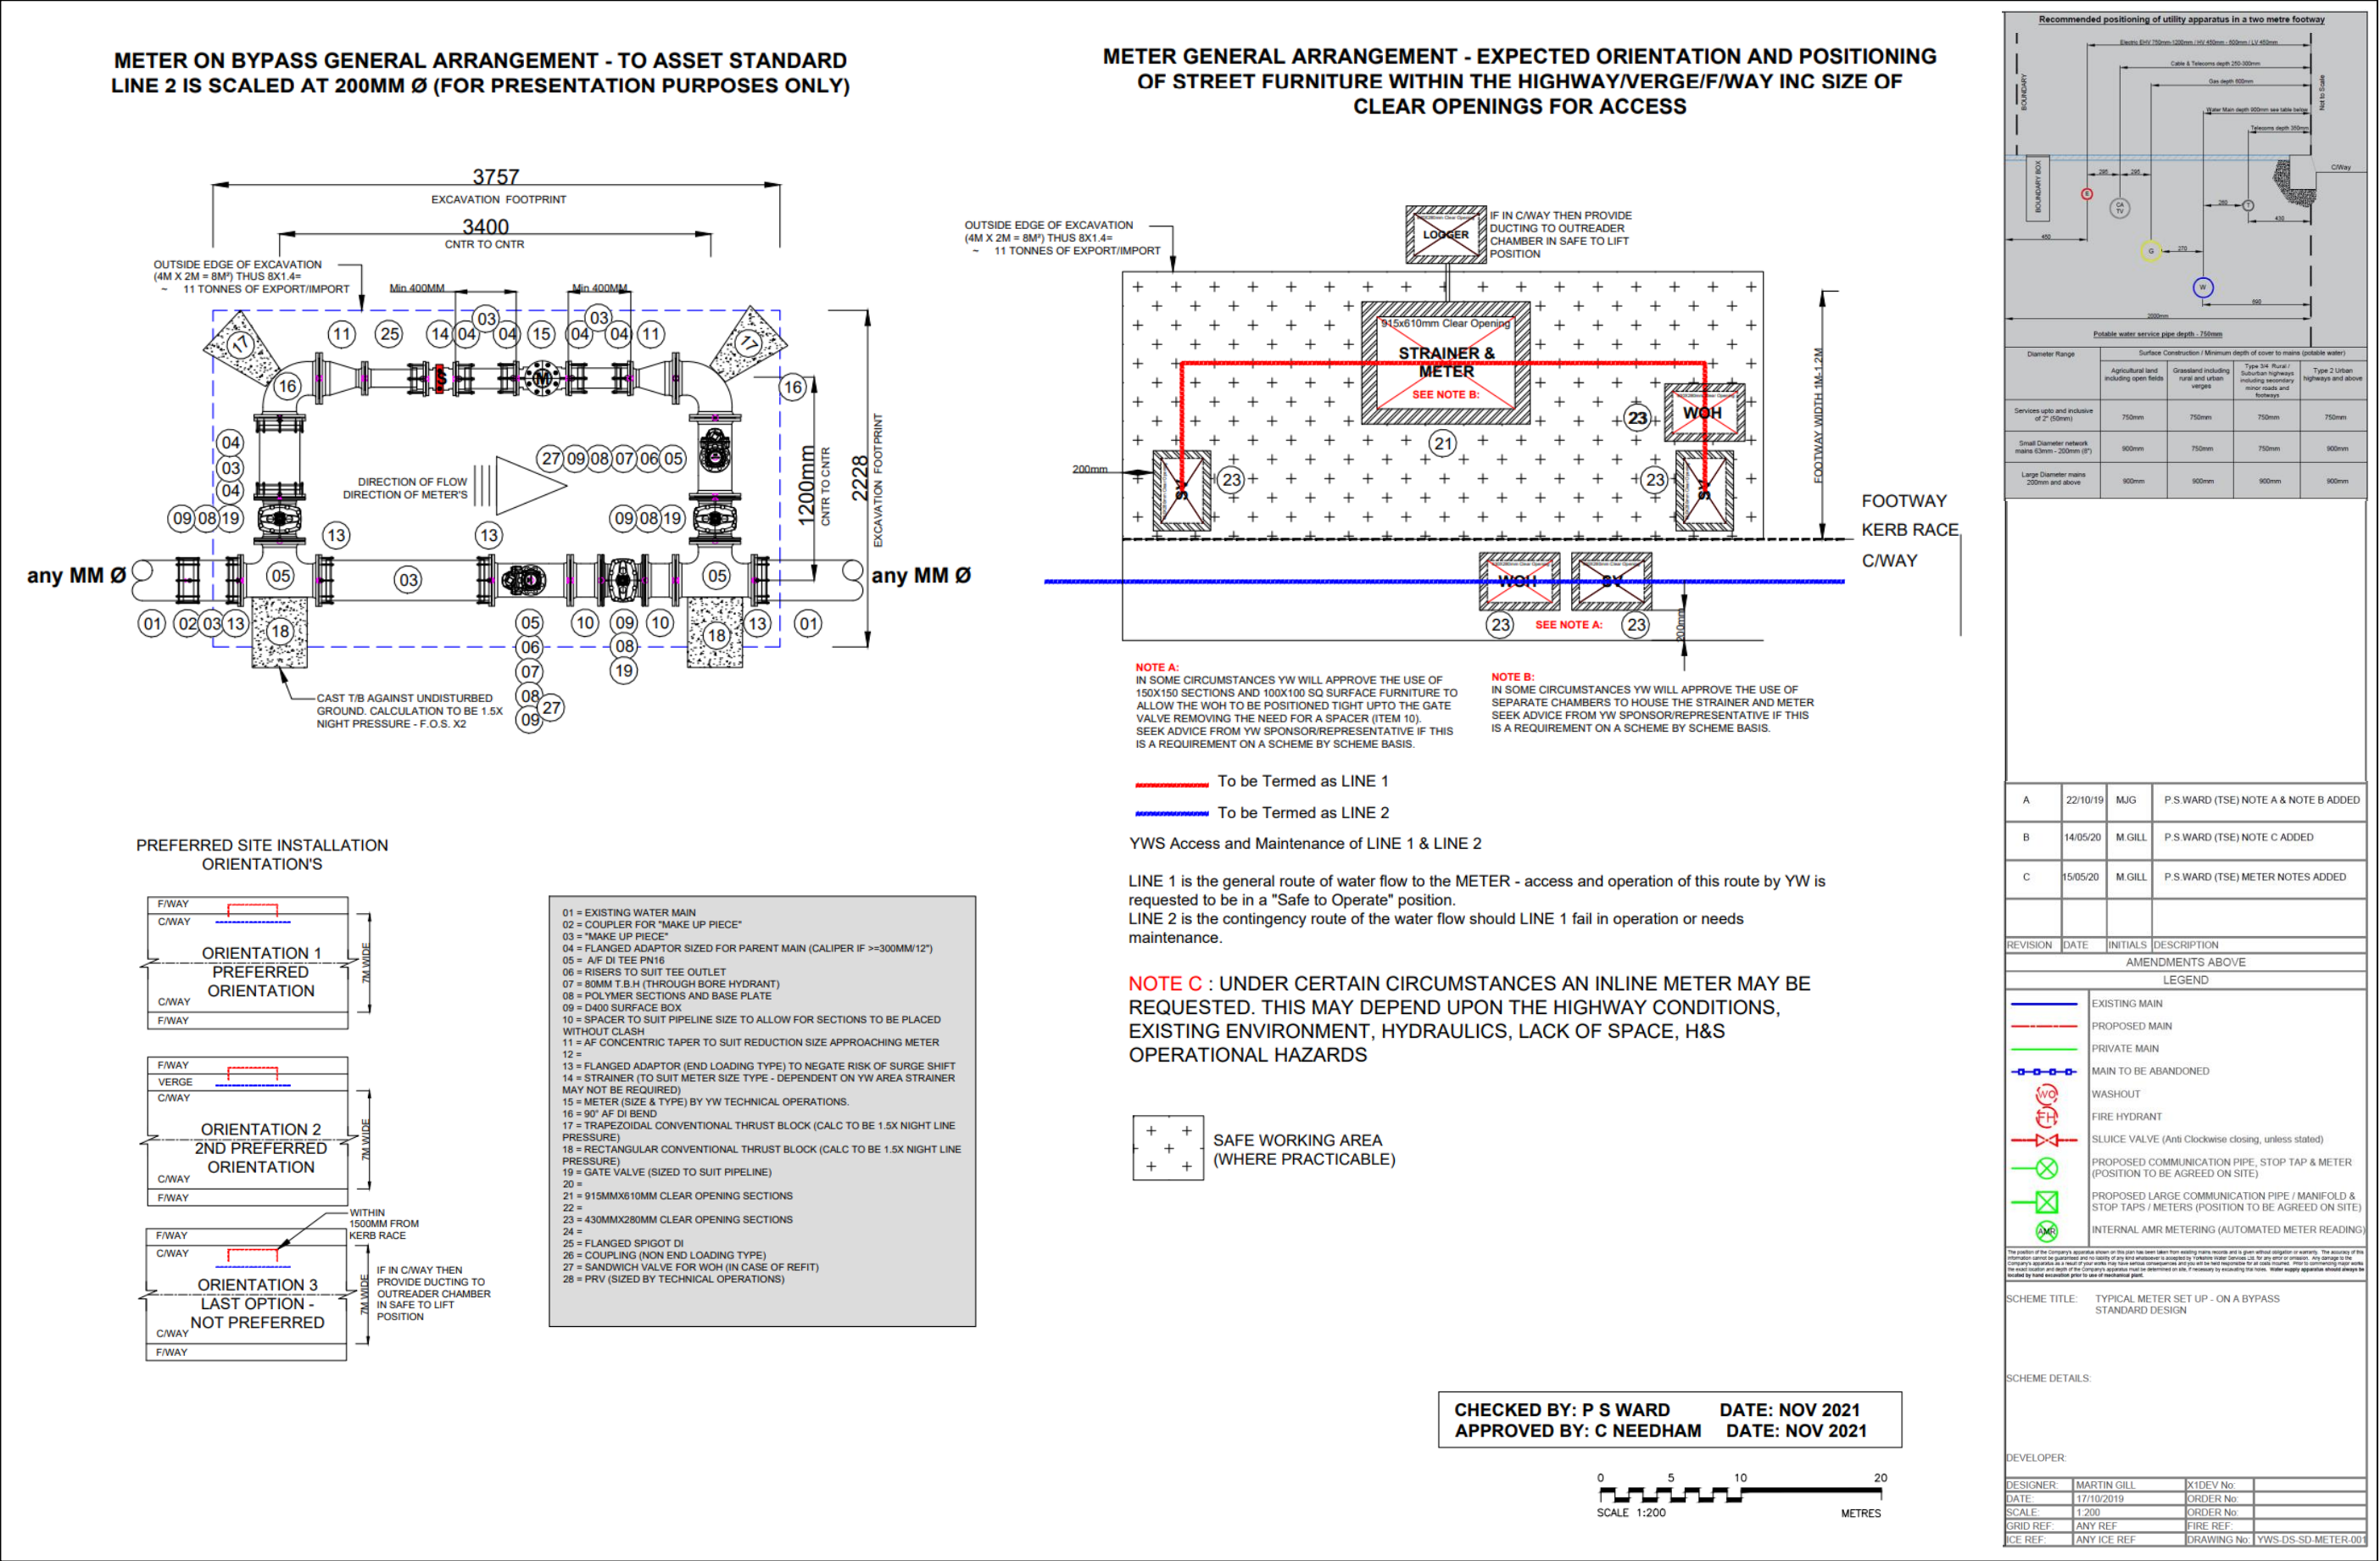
Typical Meter Set Up – On A Bypass – Standard Design
